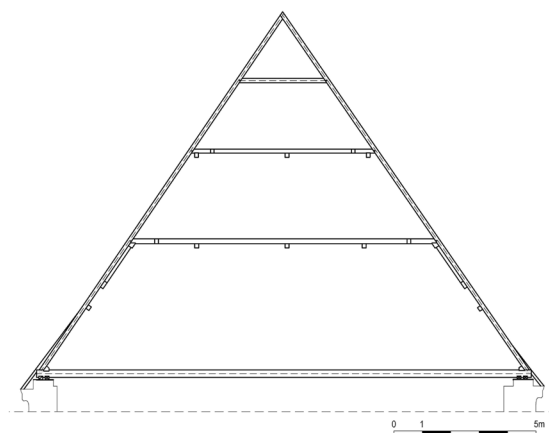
c. – Type II secondary truss in the roof structure of the Kogălniceanu street Reformed church, Cluj-Napoca
